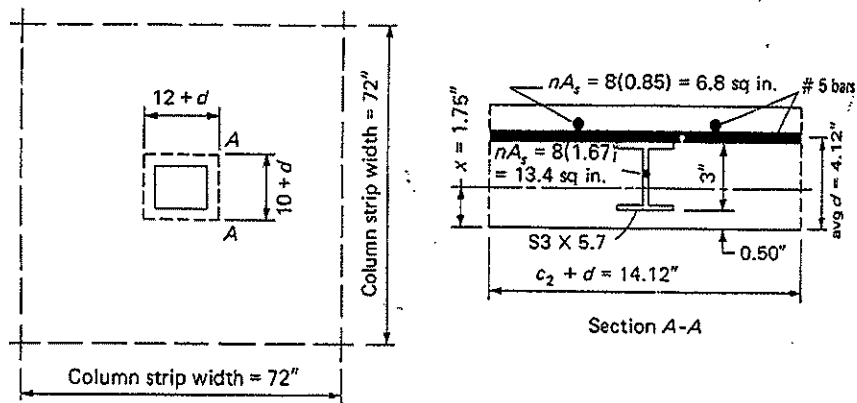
Cracked slab section of width $(c_2 + d)$, Example 16.16.2.
